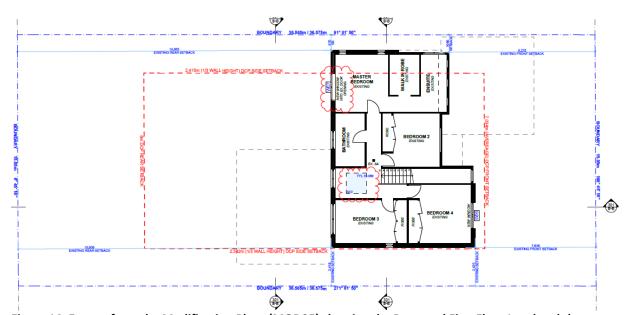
Extract from the Modification Plans (MOD05) showing the Proposed First Floor Level and the changes to W07 off the master bedroom
